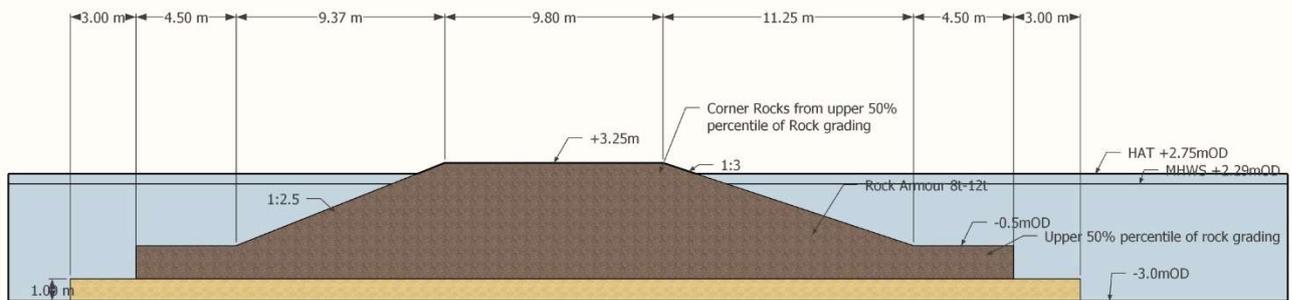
Sketch of town beach breakwaters according to Layout 3
